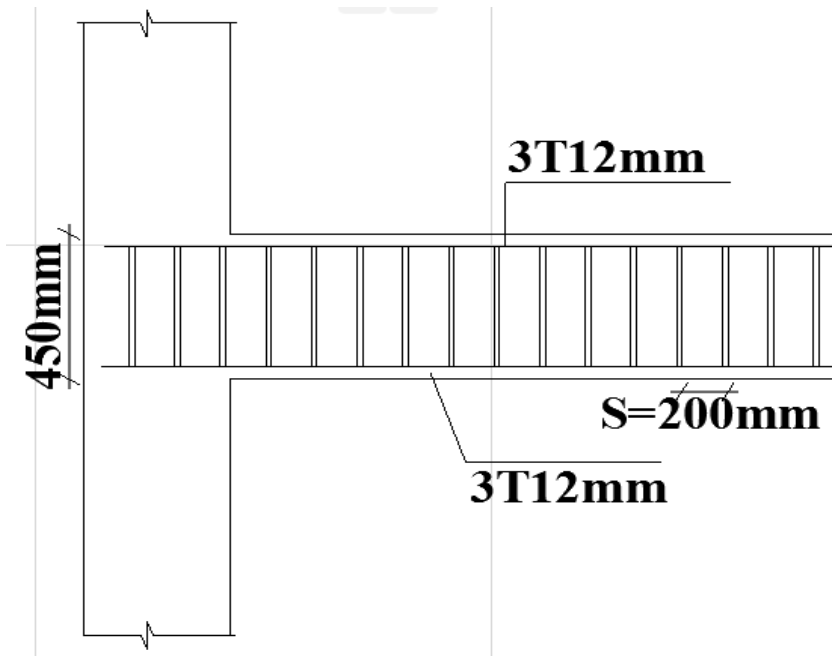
48: Longitudinal section of the steel reinforcement of the beam
